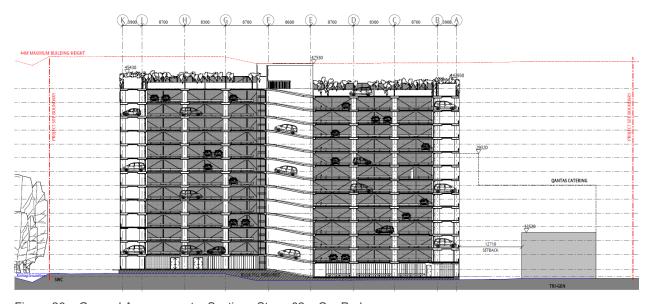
General Arrangement – Sections Stage 02 – Car Park
